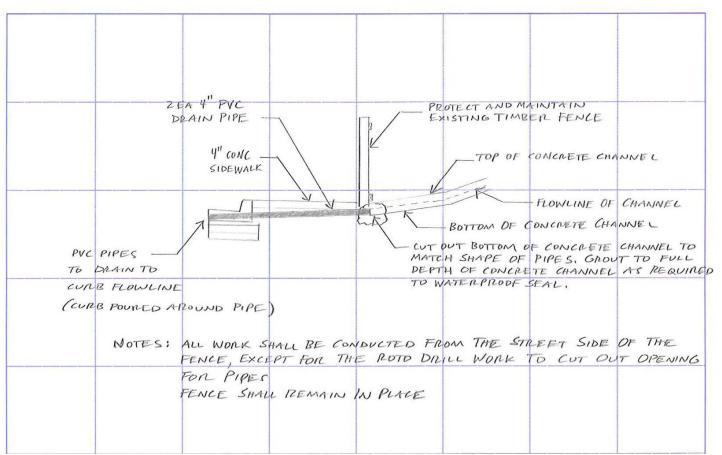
Right of way for drainage improvements in SW corner of RBH Property.
